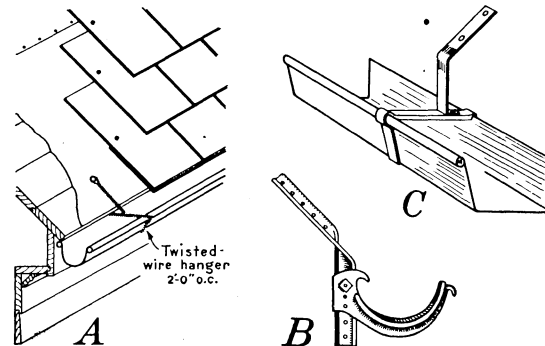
Hanging eaves trough: A, Circular section; B, adjustable hanger; C, rectangular section.
